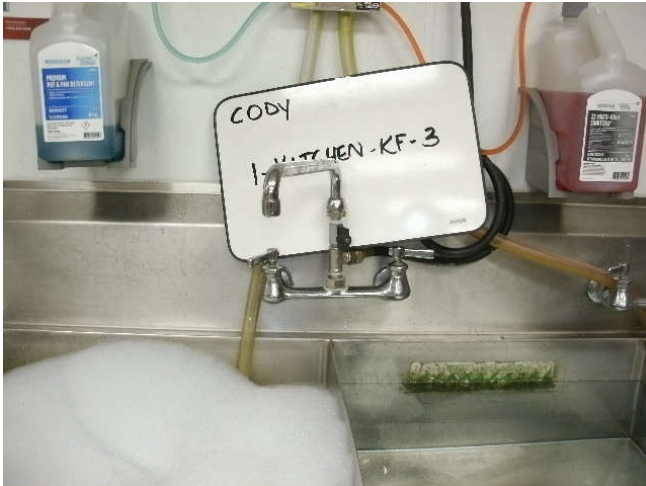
Kitchen faucet, located on the 1st floor, in the kitchen – left fixture (dish washing).
